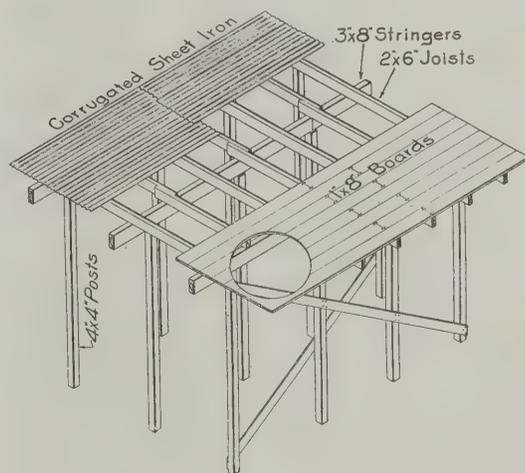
Forms for Flat Slab; Construction Using Joists and Stringers
